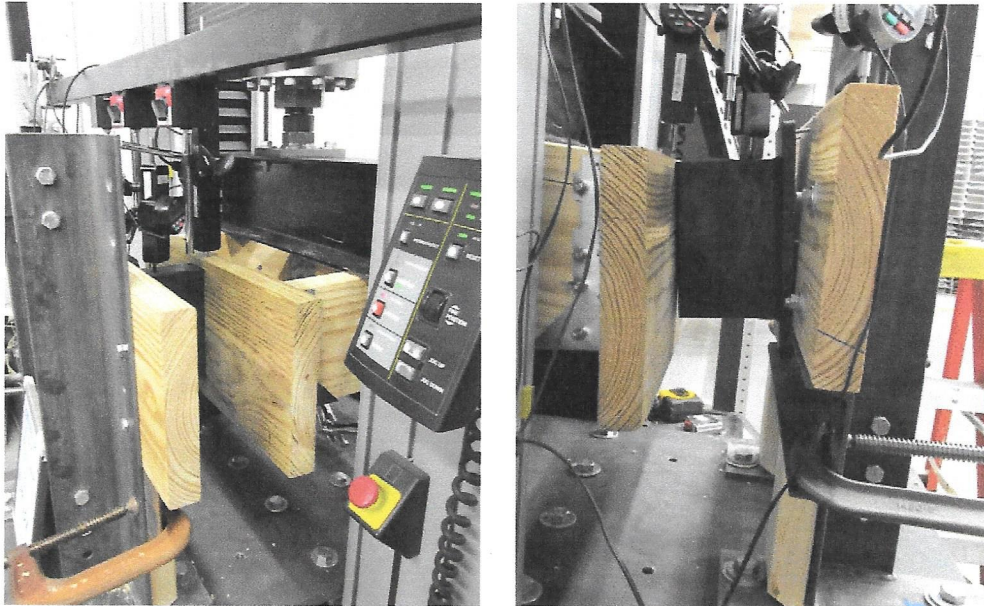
Additional Test Setup Views showing Dial Gauge Placements (Left and Right) and a Test In-Progress (Right)
